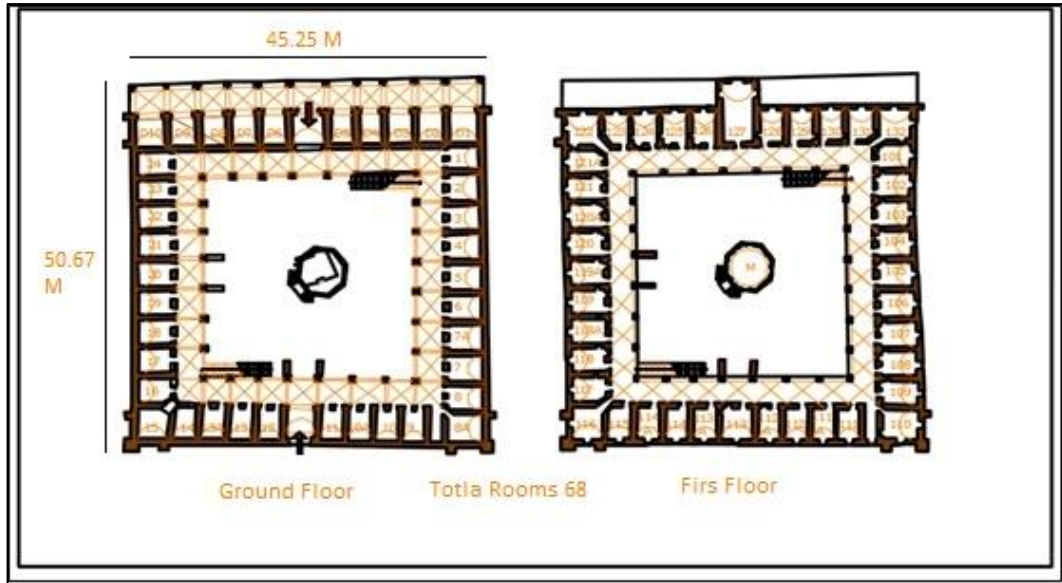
Ground and 1<sup>st</sup> Floor Plans of the Büyük Han.
